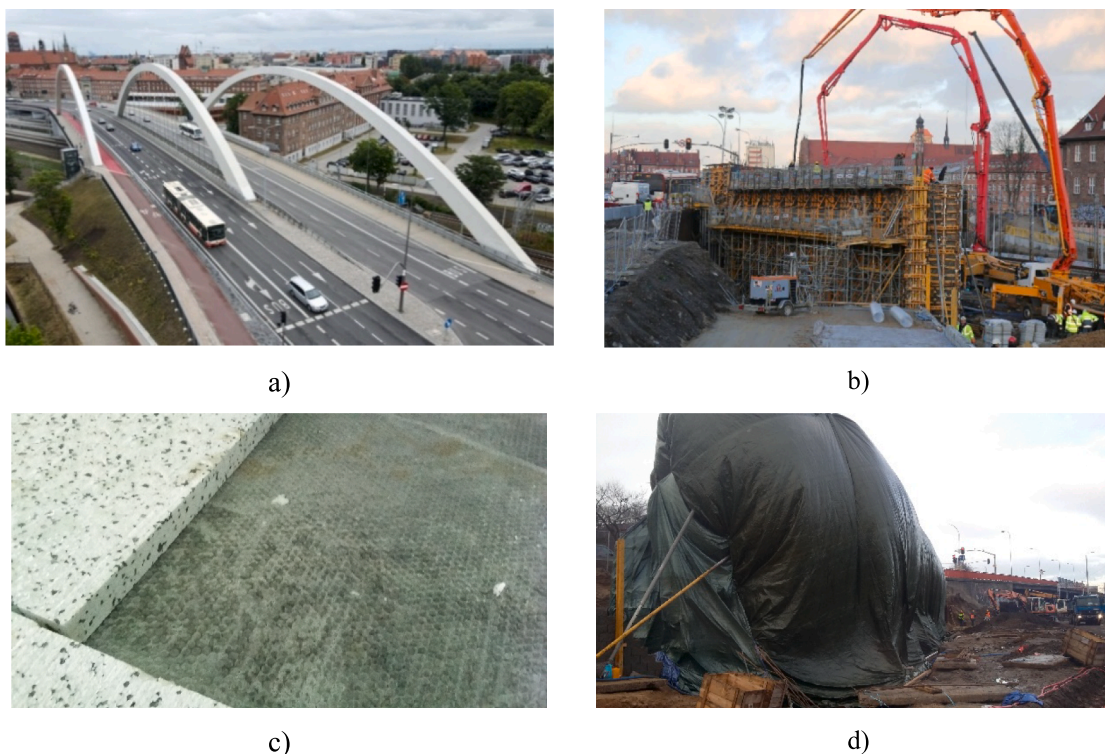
a) View of the bridge opened for the public [33], b) concrete pumping, c) Styrofoam protection, d) the wall covered with tarpaulin.
